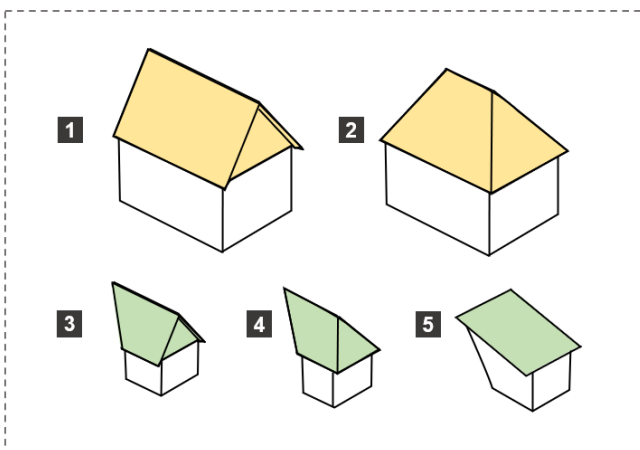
Styles for Primary and Secondary Roof Structures (Illustration)
